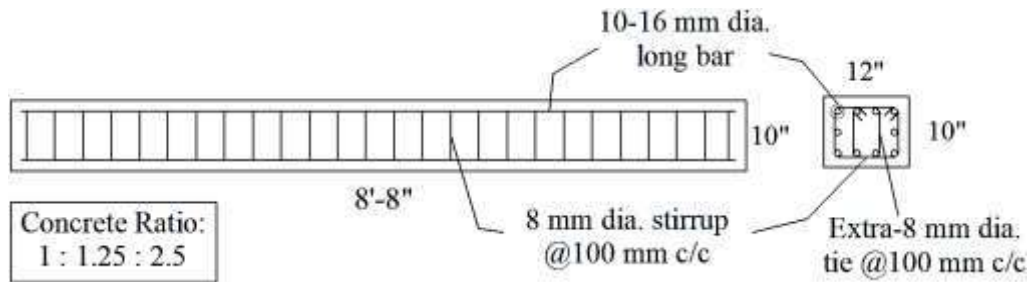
Dimension and reinforcement detailing of the RCC base
